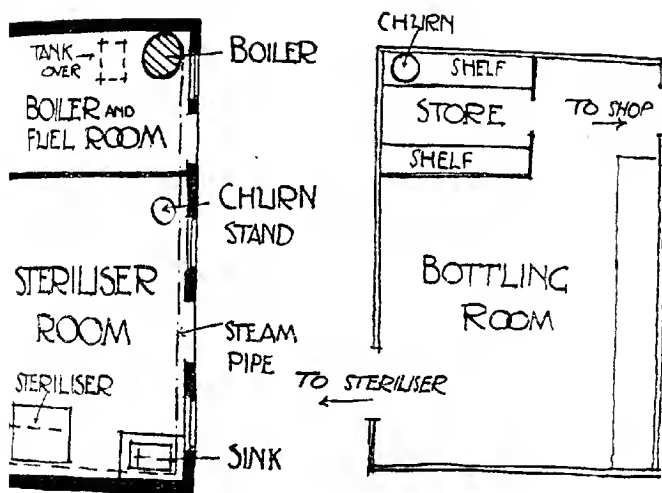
Old Stable adapted for Sterilizing Plant.
